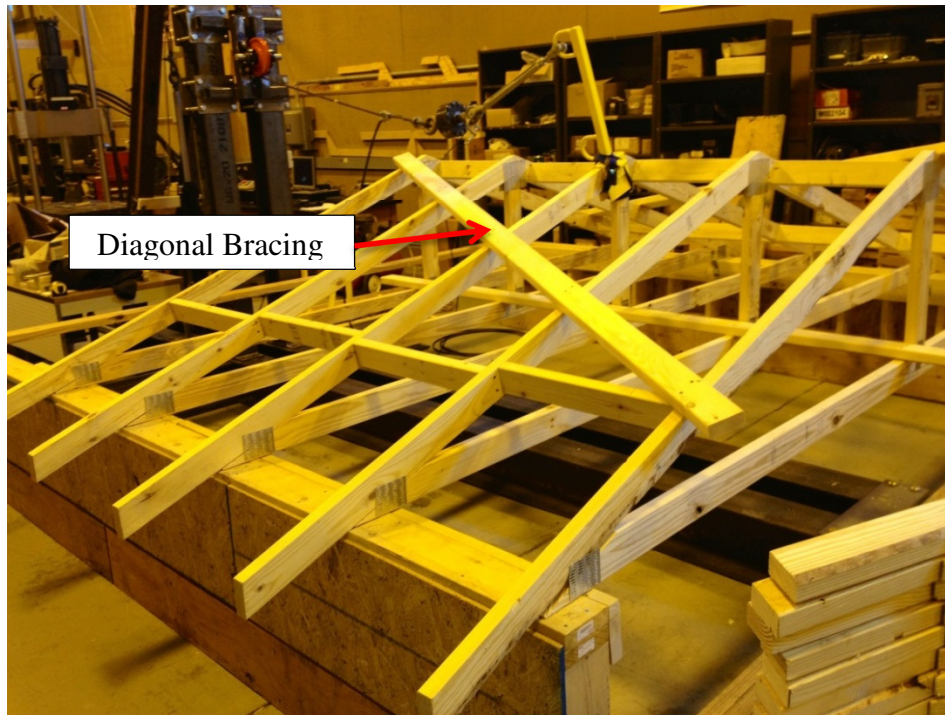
Diagonal bracing configuration on an in-between braced truss assembly
